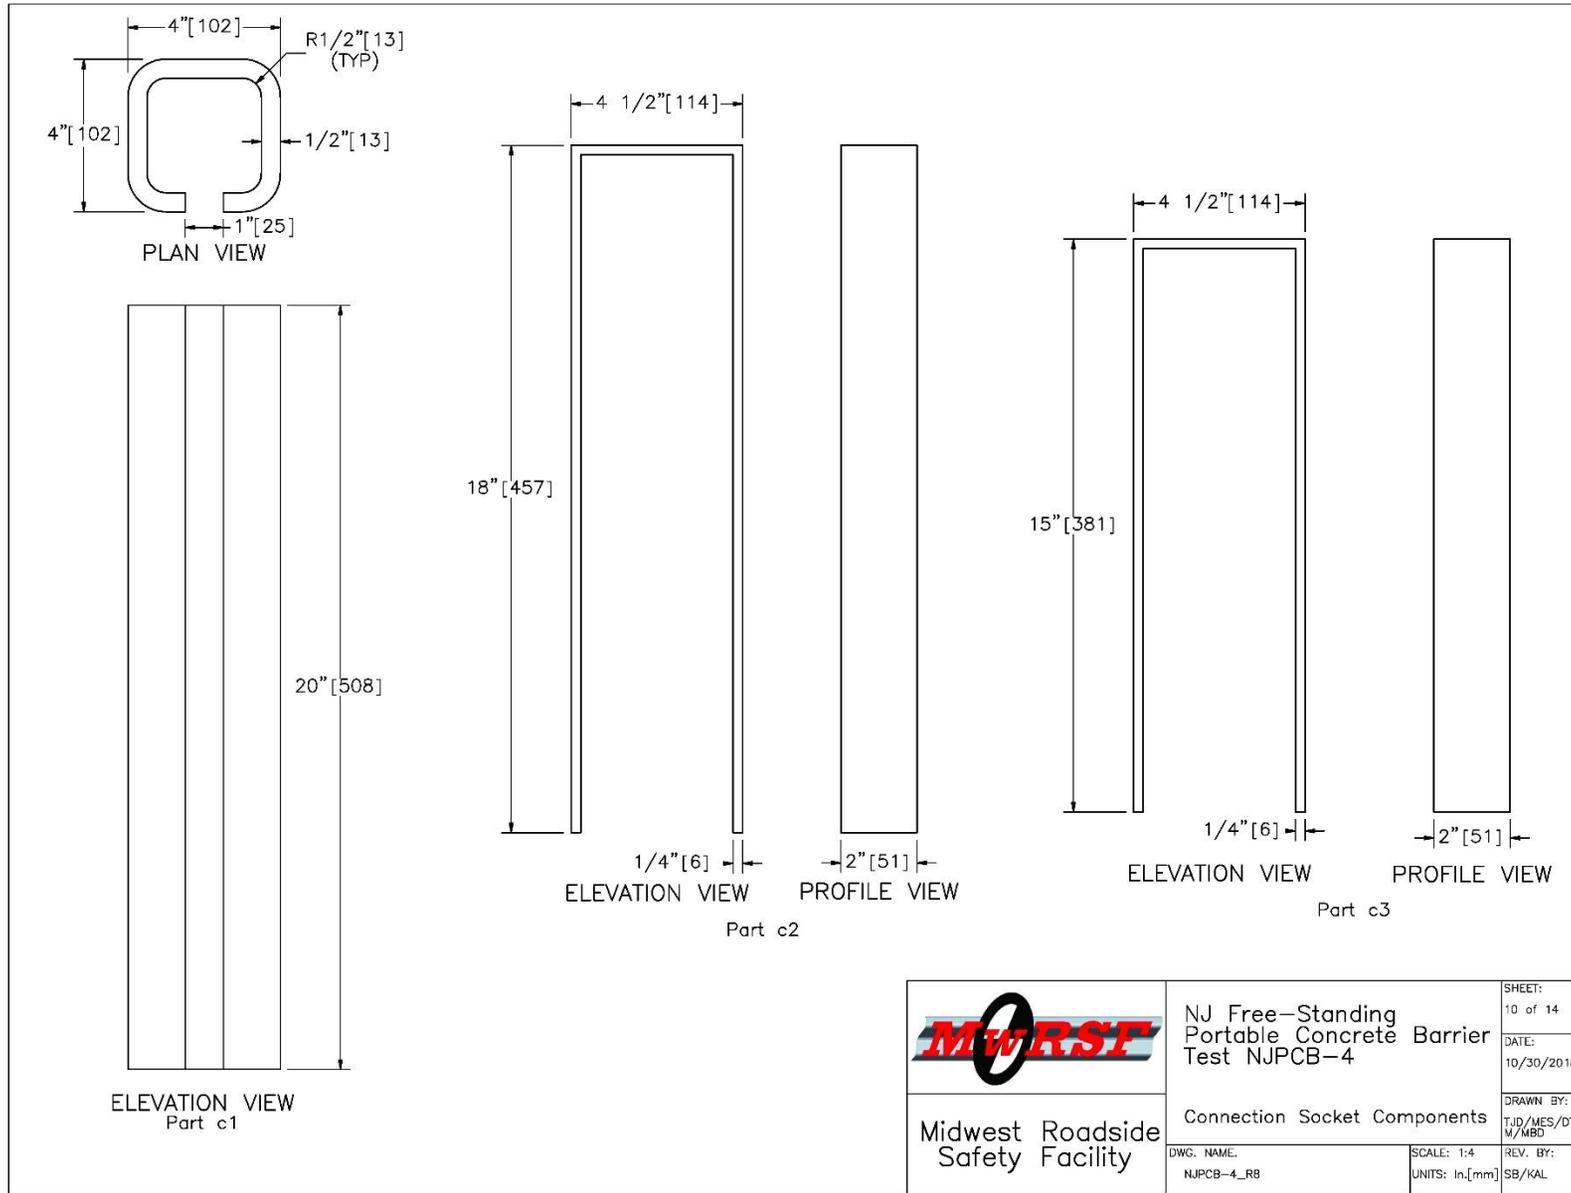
PCB Connection Socket Component Details, Test No. NJPCB-4
